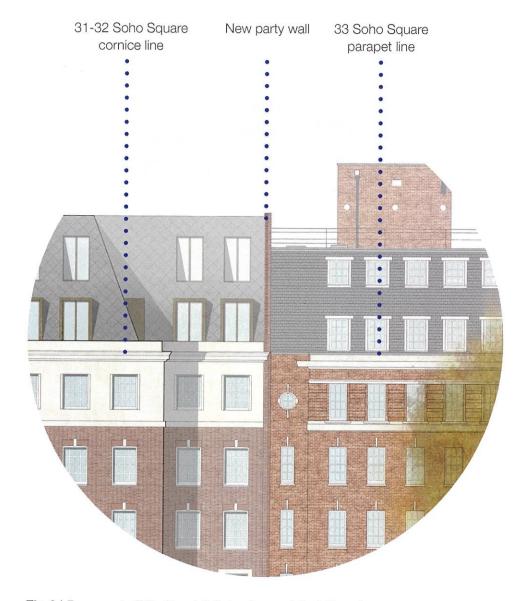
| Proposed - Frith Street & Soho Square West Elevation
